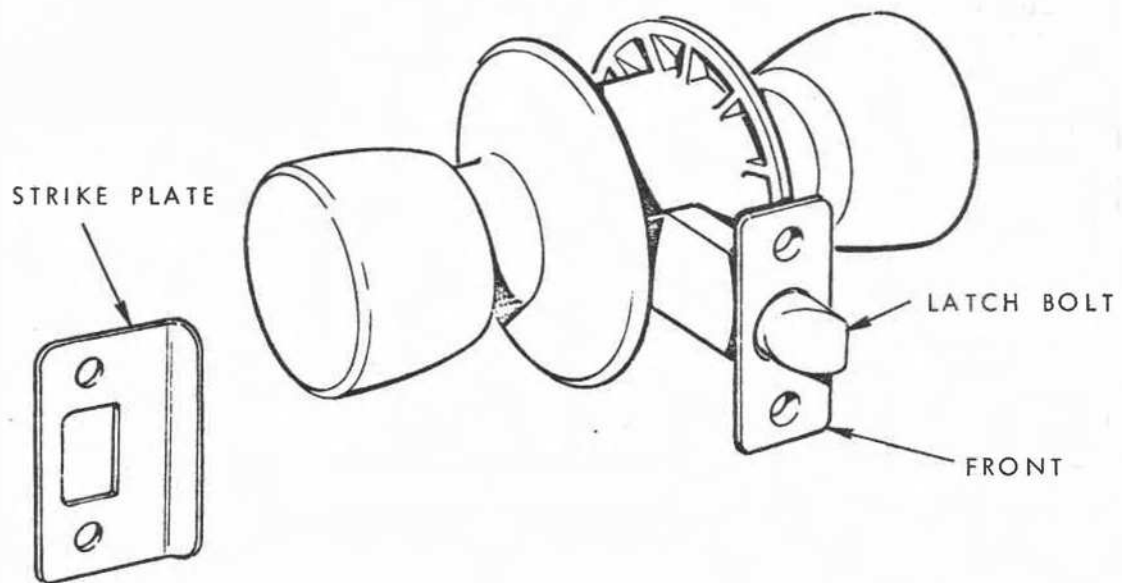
A TYPE 1 LATCHBOLT IN DOOR EDGE
